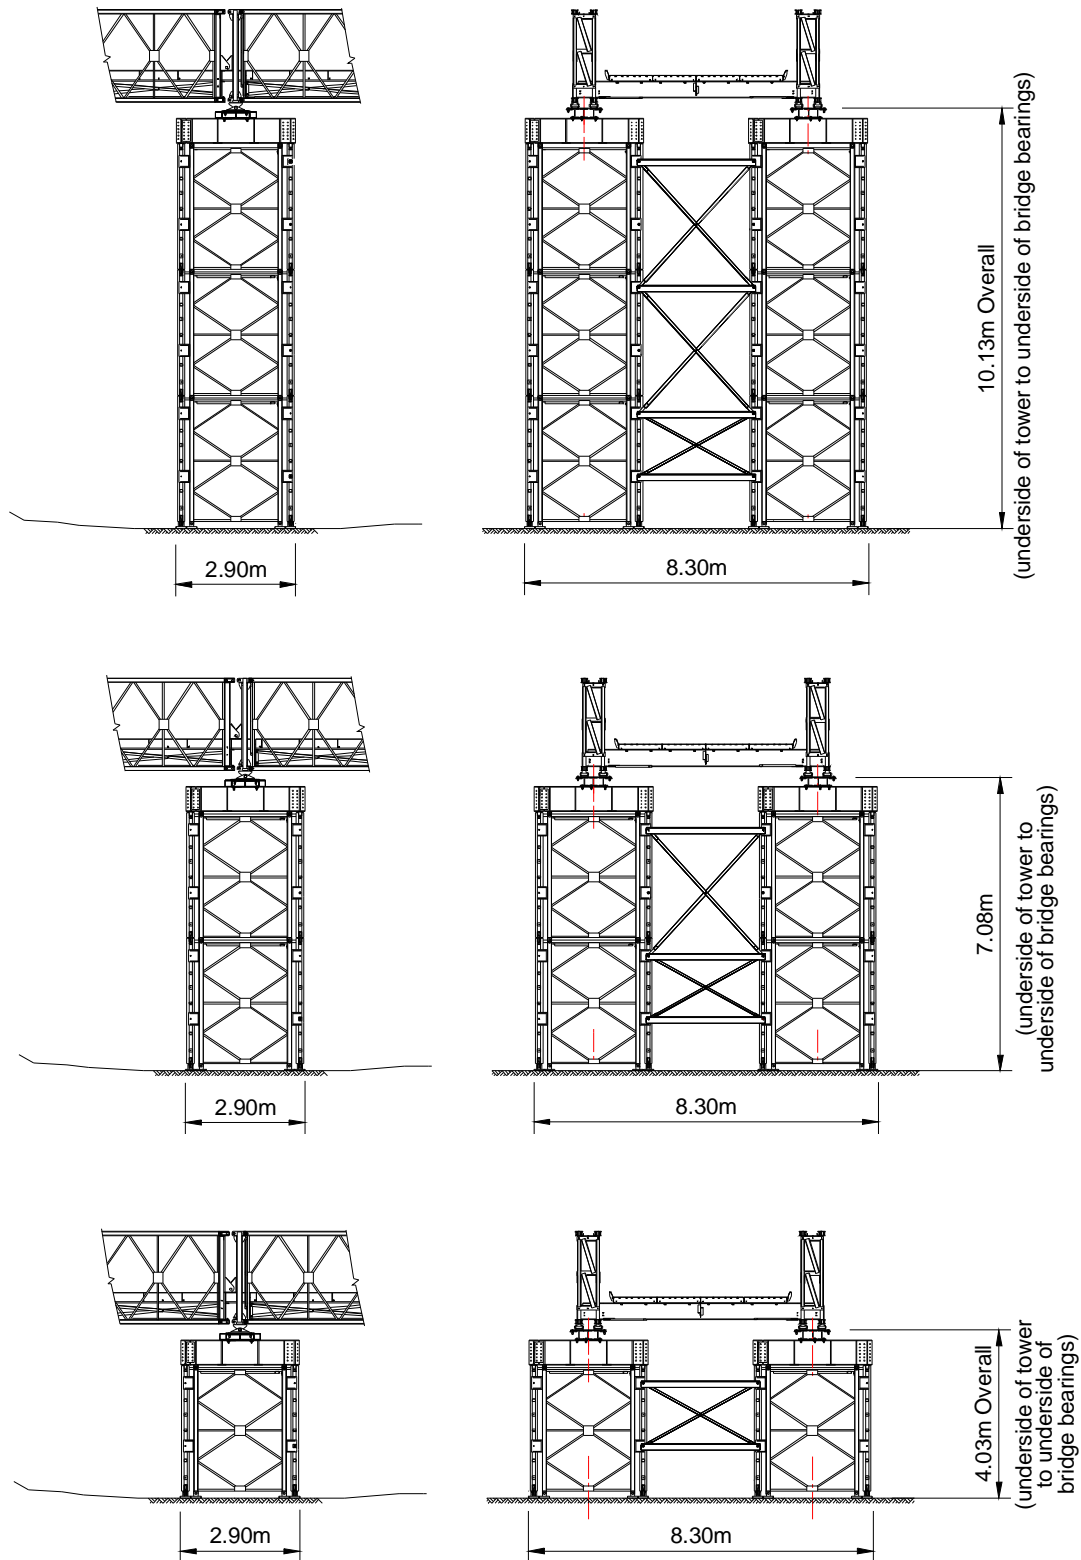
Overall dimensions of one, two and three bay high fixed piers
